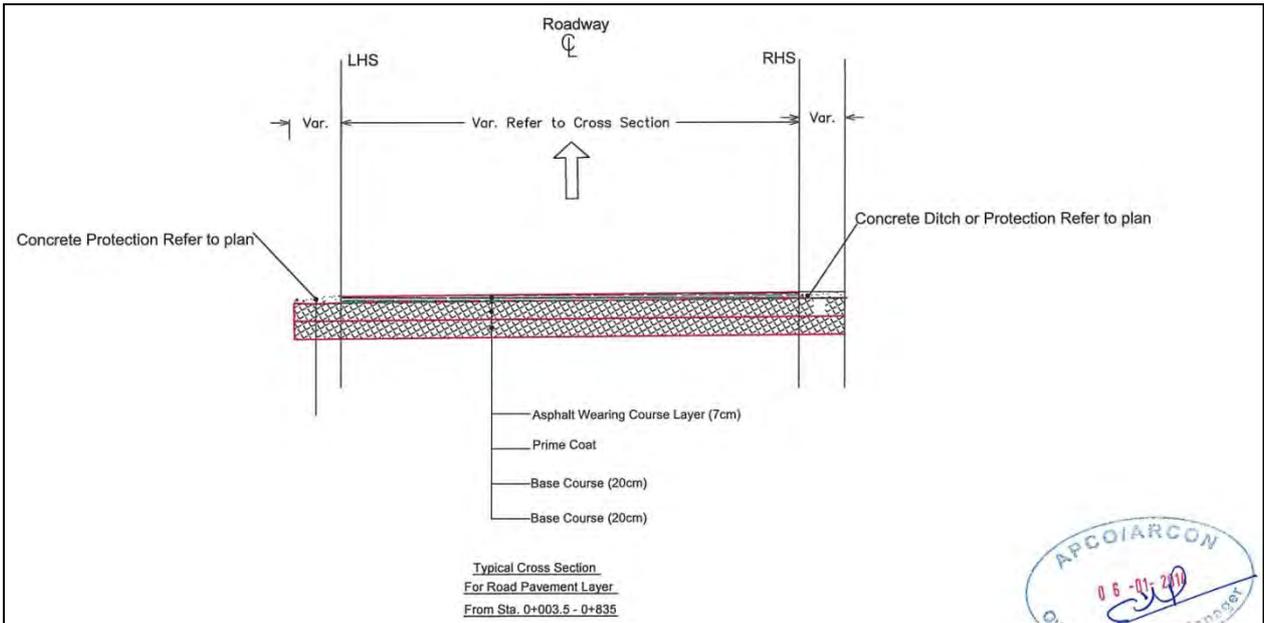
Project 02- WJB- Typical cross section from St. 0+003 to St. 0+835.
